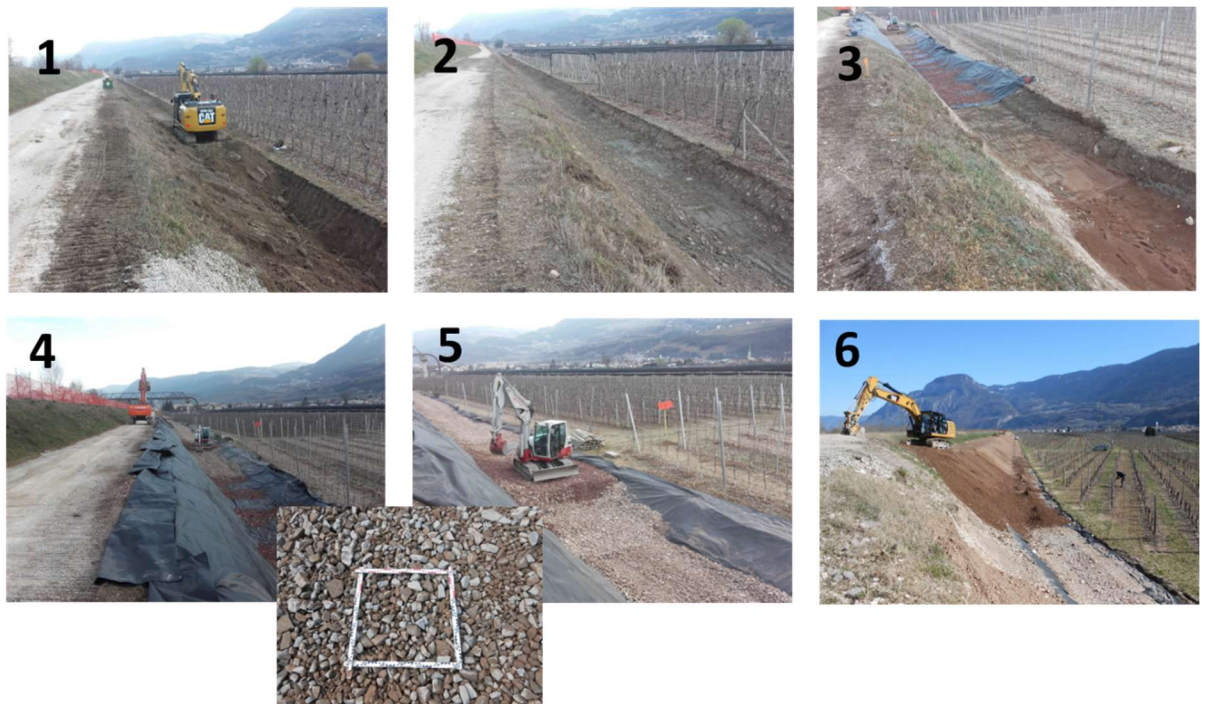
Installation steps of filter drainage at the toe of the berm and construction of the berm.
